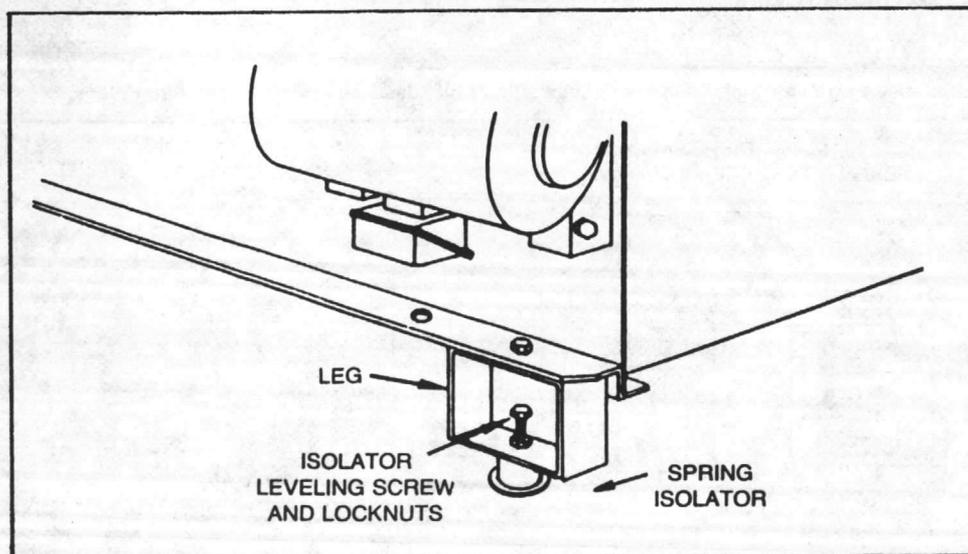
Attaching the Mounting Leg and Spring Isolator to the High Pressure Sprayed Coil Unit
